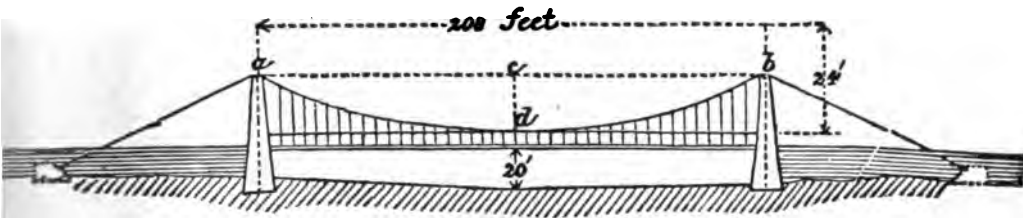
is an elevation of the Kullar suspension bridge, Caimbatore,¹ cd should be 24 feet (scale 80 feet = 1 inch).
